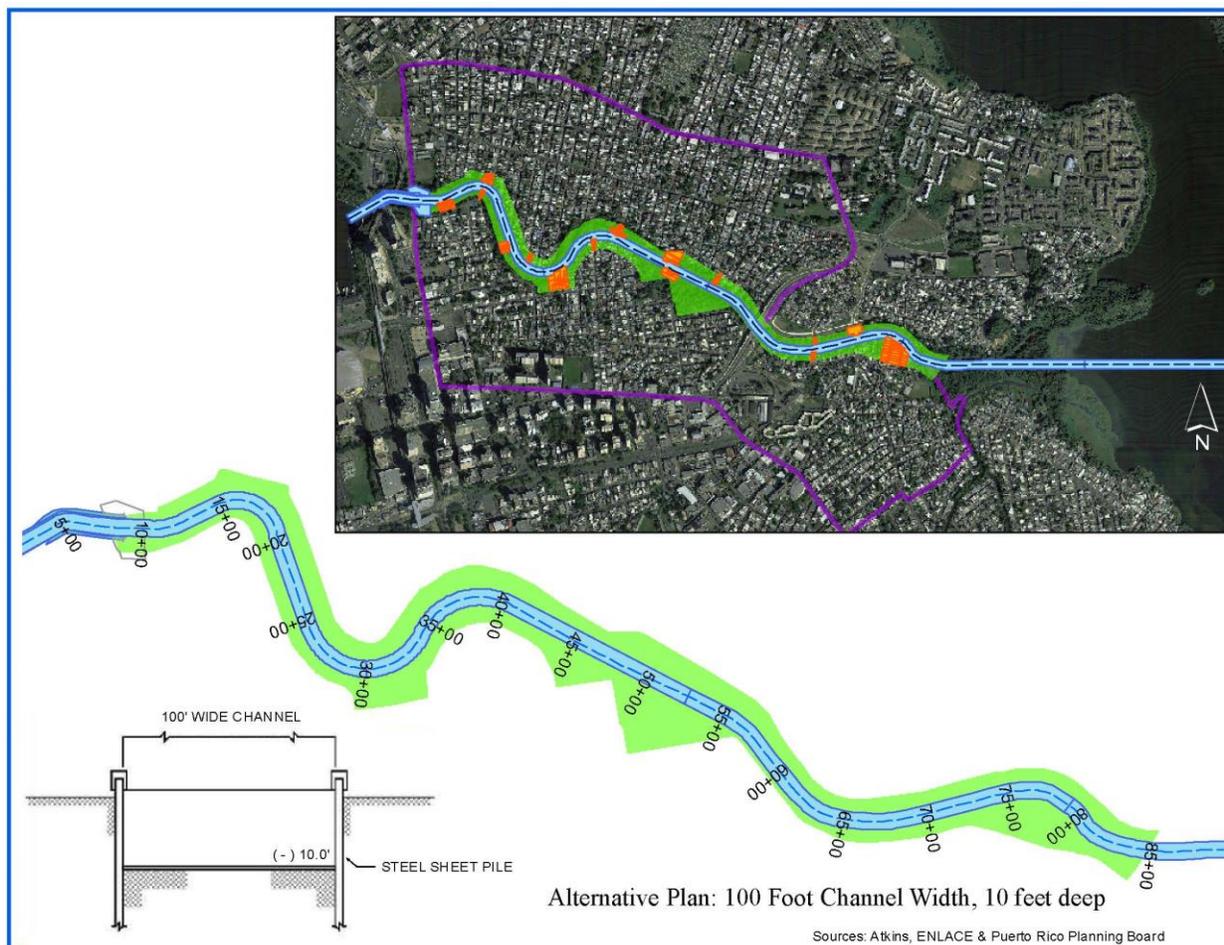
Alternative Plan 2 – 100-Foot Channel Width, 10-Foot Depth
